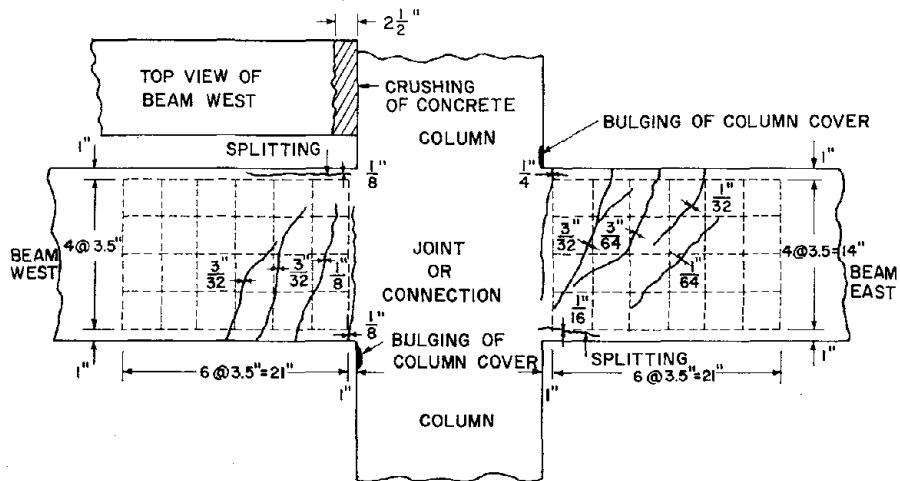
Major Cracks in Subassemblage BC4 at LP 23
